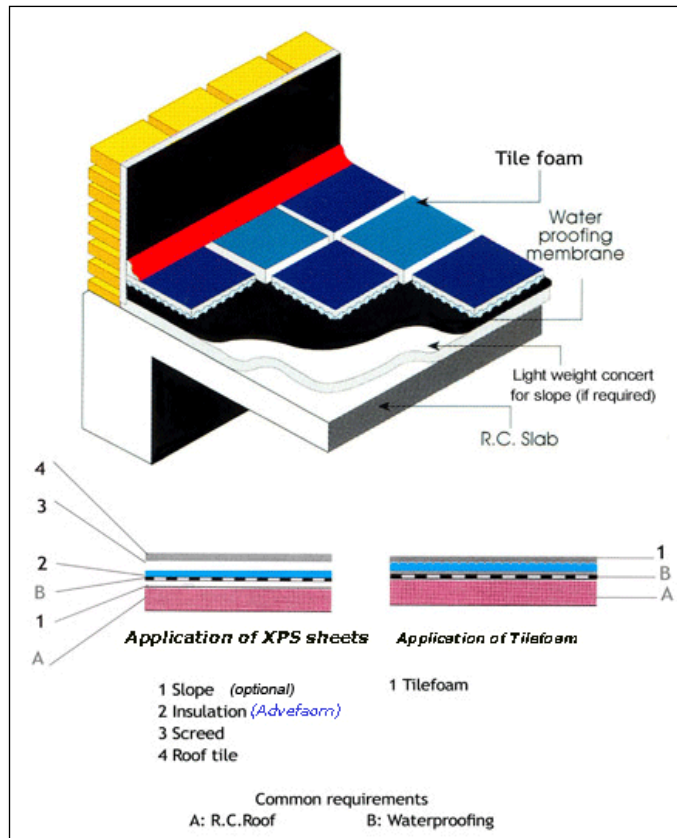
Tilefoam installation method and roof water outlet (Tilefoam, 2015)
